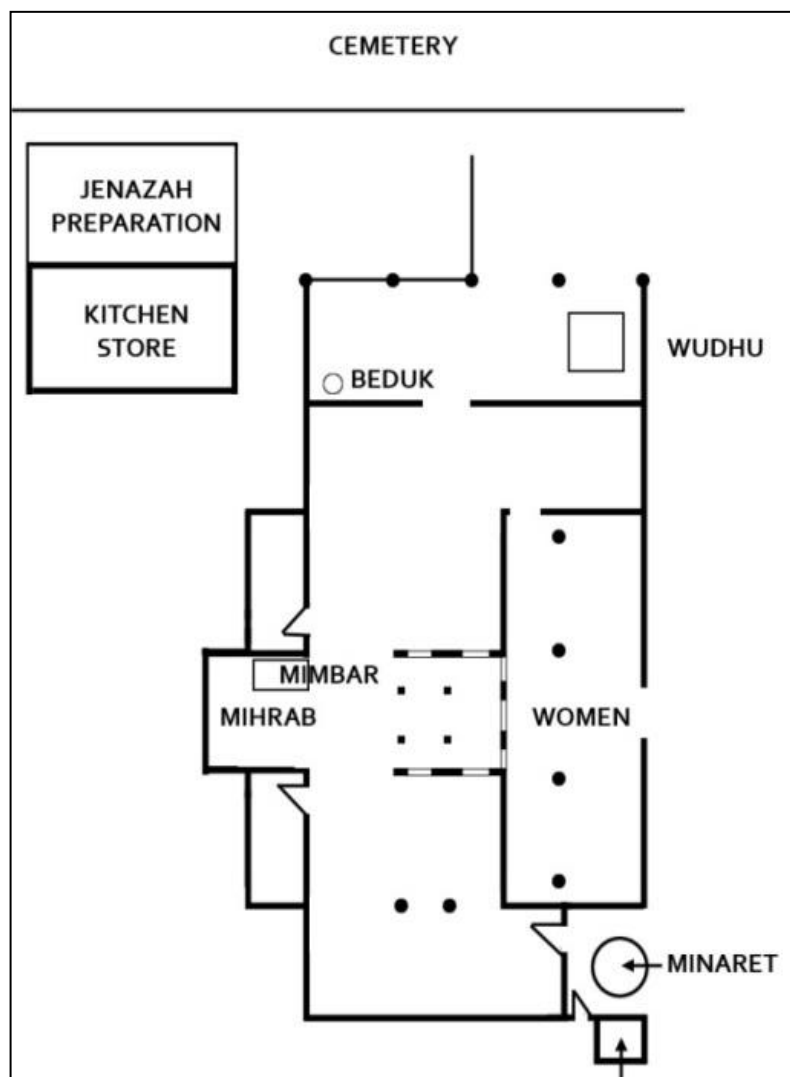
Masjid Batak Rabbit rectangular floor plan layout
